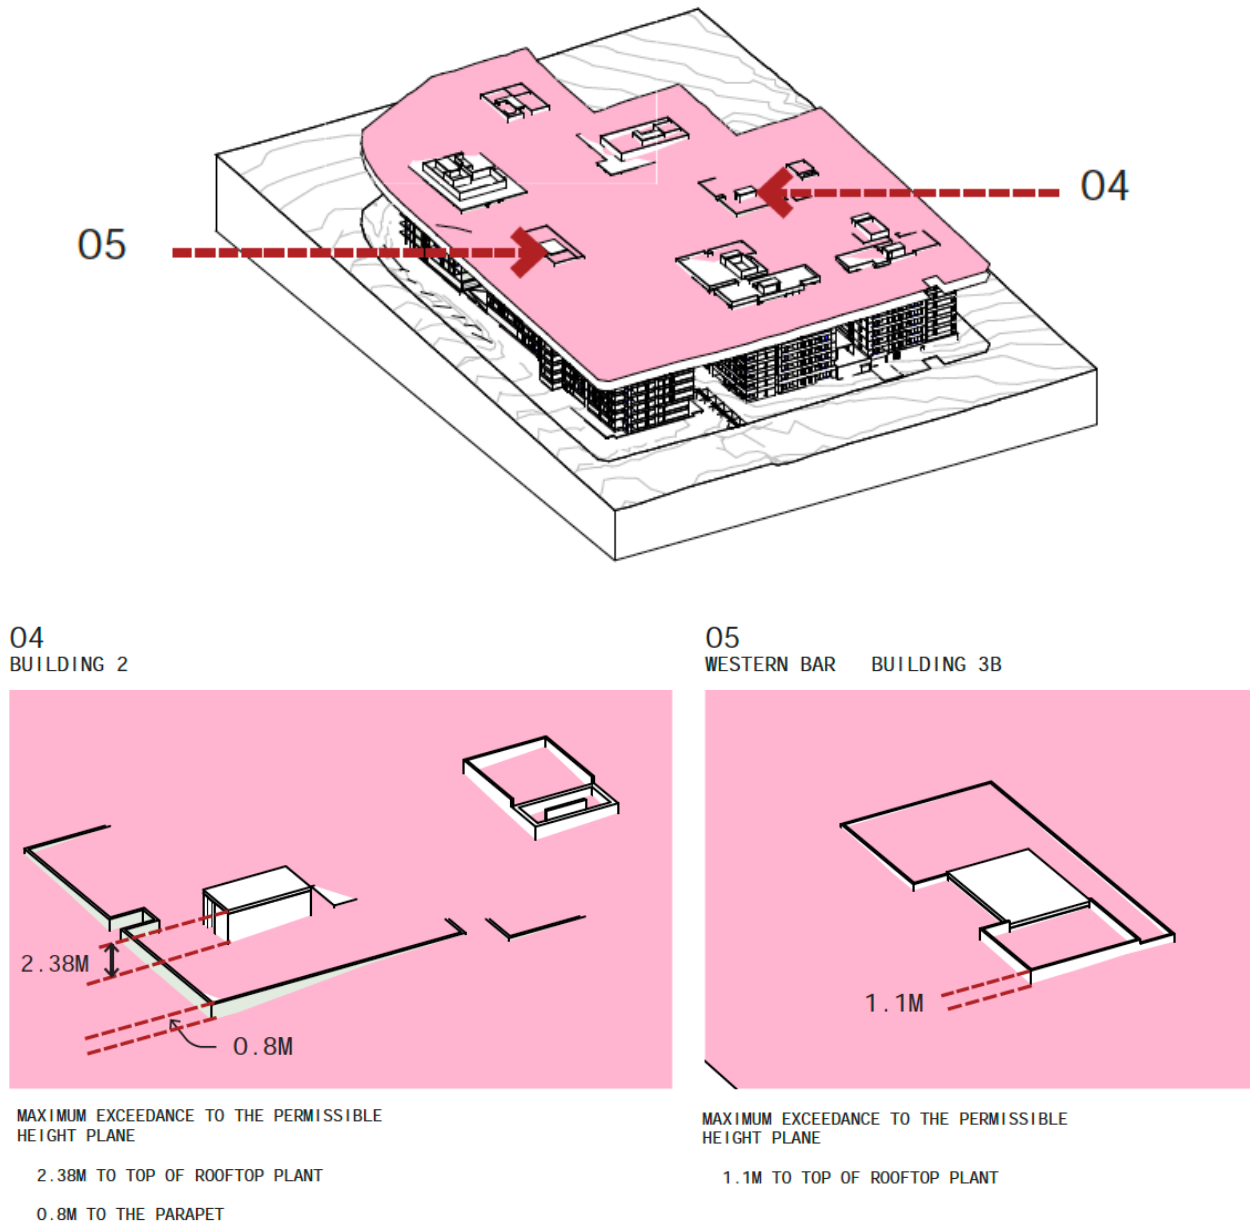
Proposed extent of height exceedance for Building 2 and Building 3B (Source: BVN)
